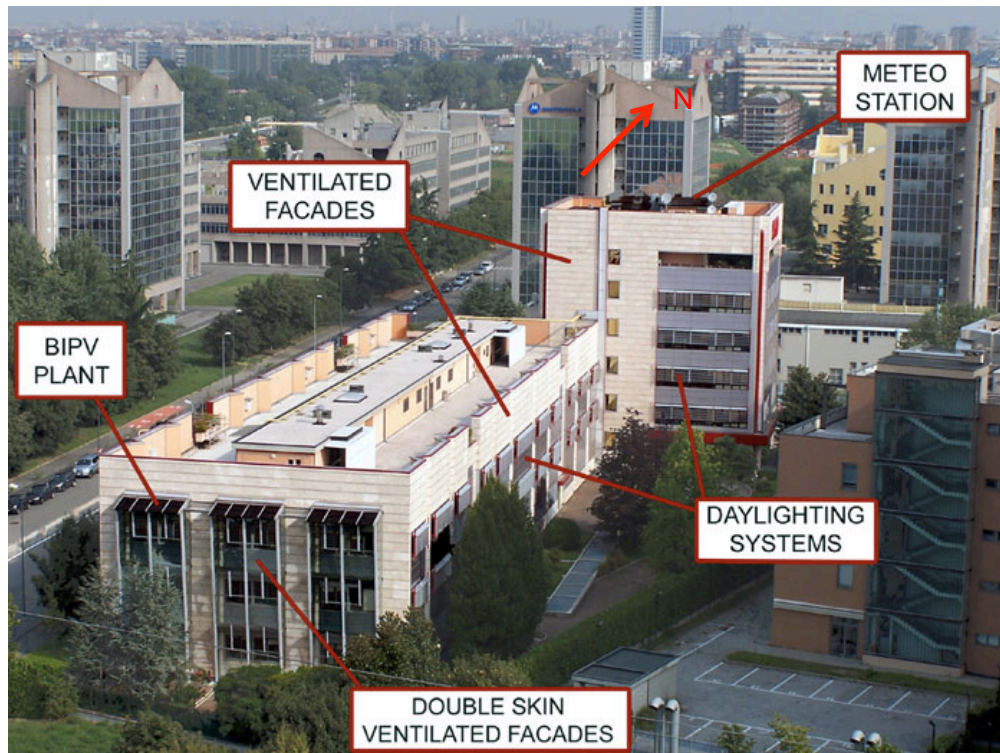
ERGO Building Layout (Zerofootprint, 2011)
